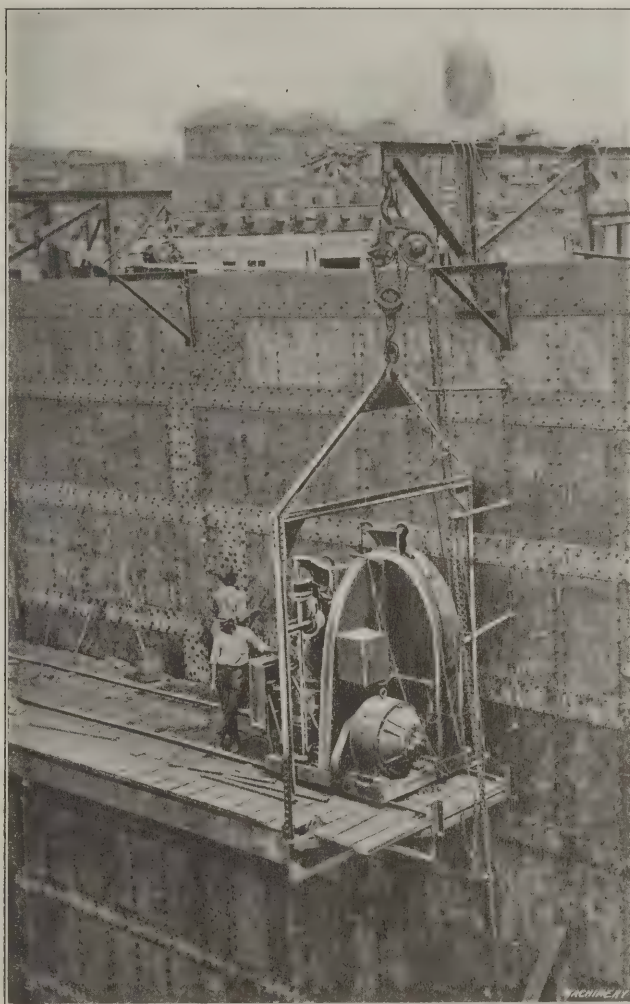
Drilling Machine on Scaffold for Drilling Rivet Holes in Panama Canal Lock Gates
